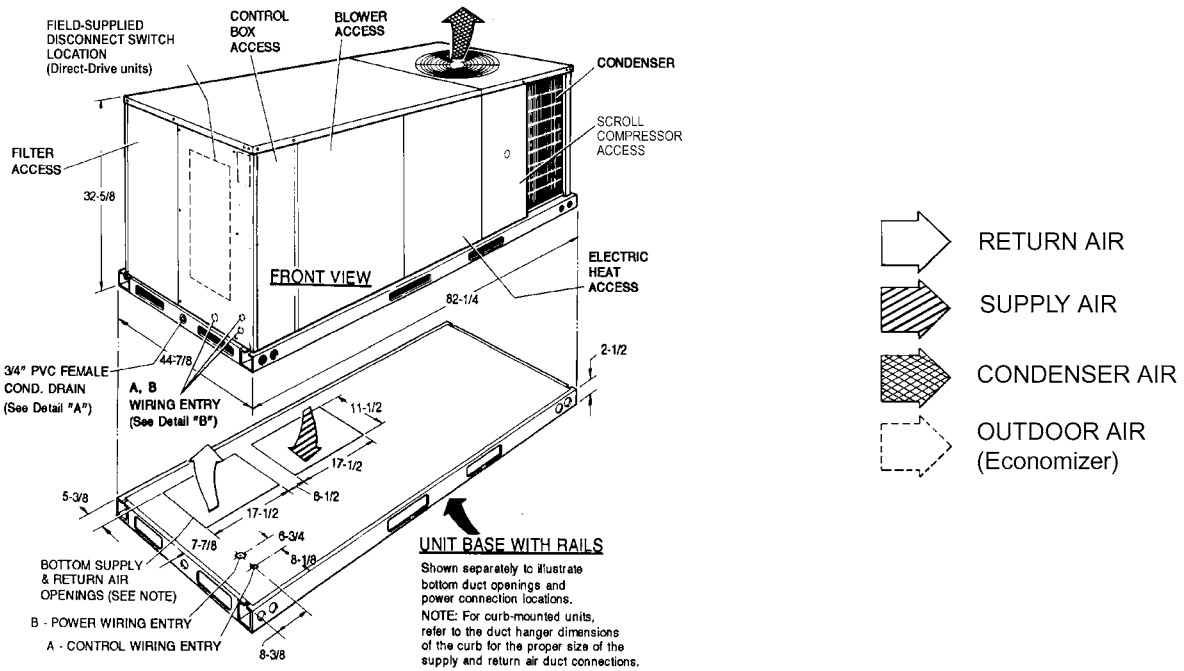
UNIT DIMENSIONS (3 - 5 TON HEAT PUMP) FRONT VIEW
